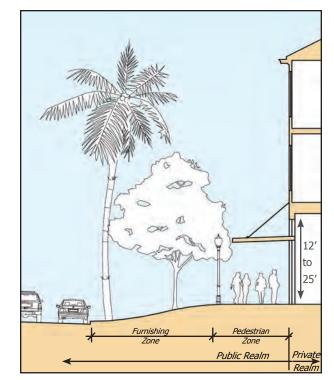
Cross Section, Raised Shopfront Frontage (Illustrative)
